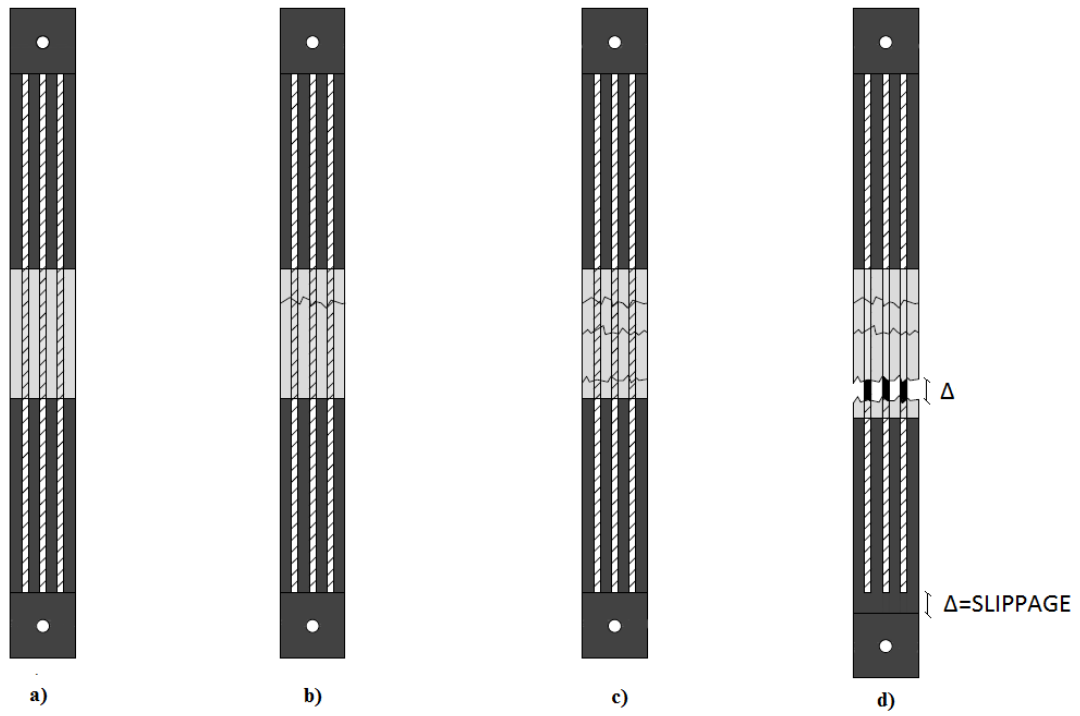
27 – a) virgin specimen, b) first macro-crack, c) cracked specimen, d) opening of one of the cracks and slippage of the fabric within the tabs
